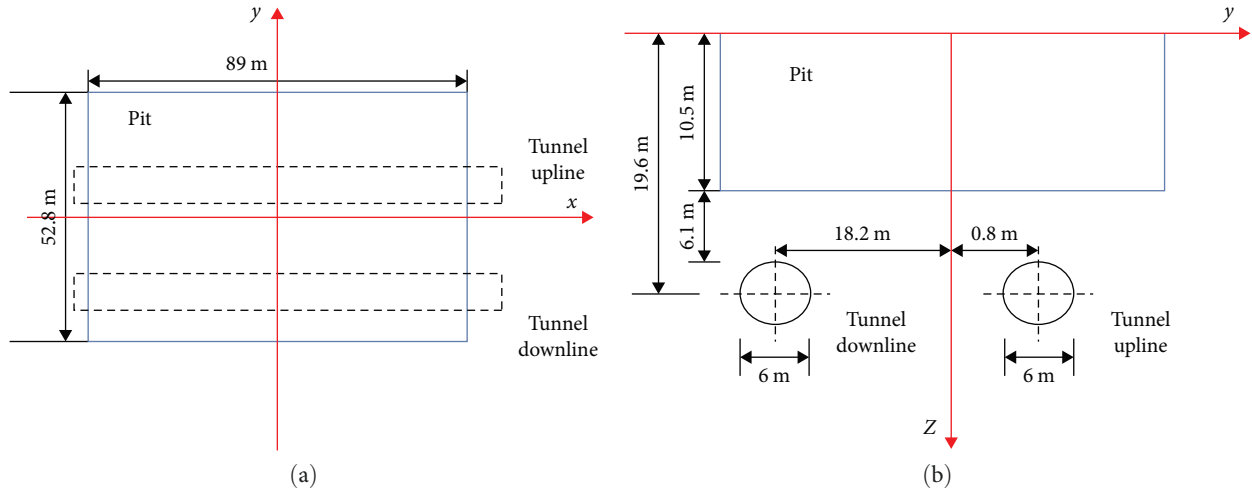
Schematic diagram of relative position between foundation pit and tunnel. (a) Foundation pit tunnel plan. (b) Elevation of foundation pit tunnel.
